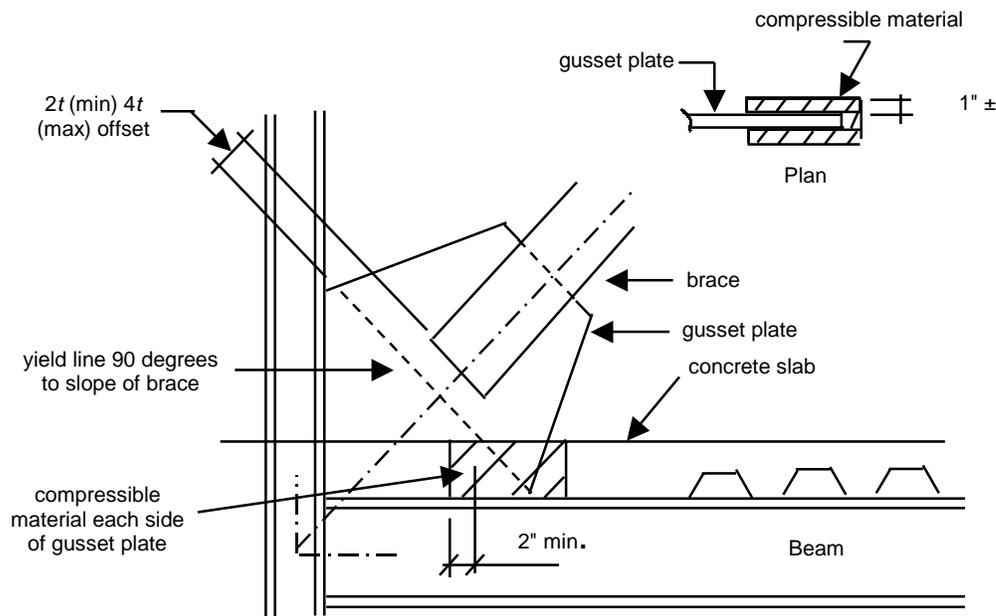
A-13. For the yield line to develop in the gusset plate, the gusset plate must be isolated from the slab
